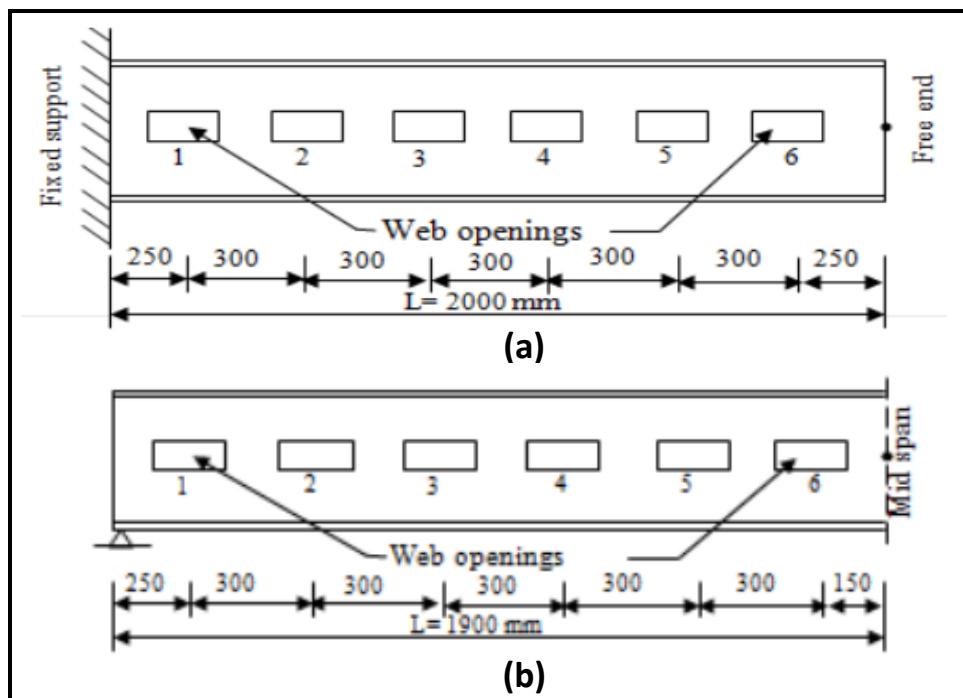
Locations of Web Openings: (a) Cantilever Beam, (b) Simply Supported Beam [33]
